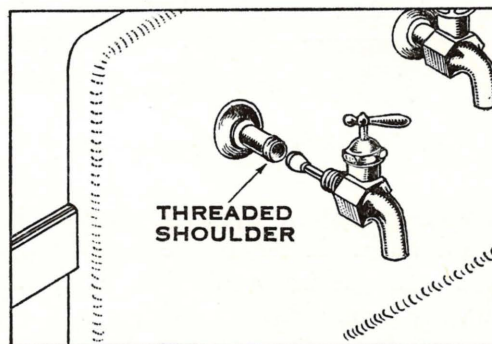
Fuller faucets are removed from the fixtures by unscrewing them at the threaded shoulder
